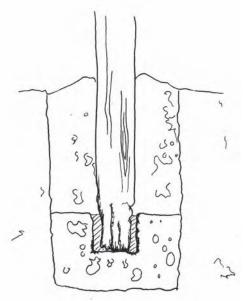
Timber stumps encased in concrete can lead to the degradation of the stump
